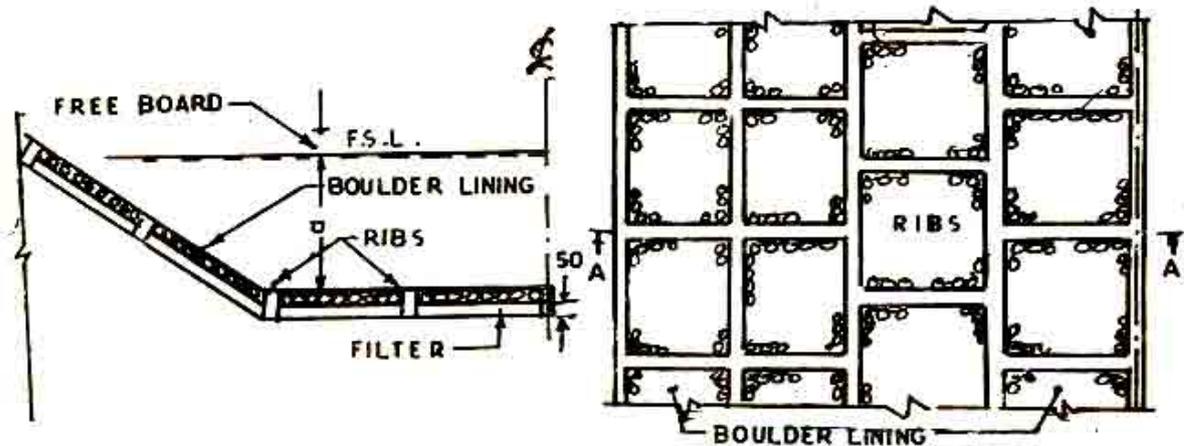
Illustratory Layout Of Pitched Lining For Canal
